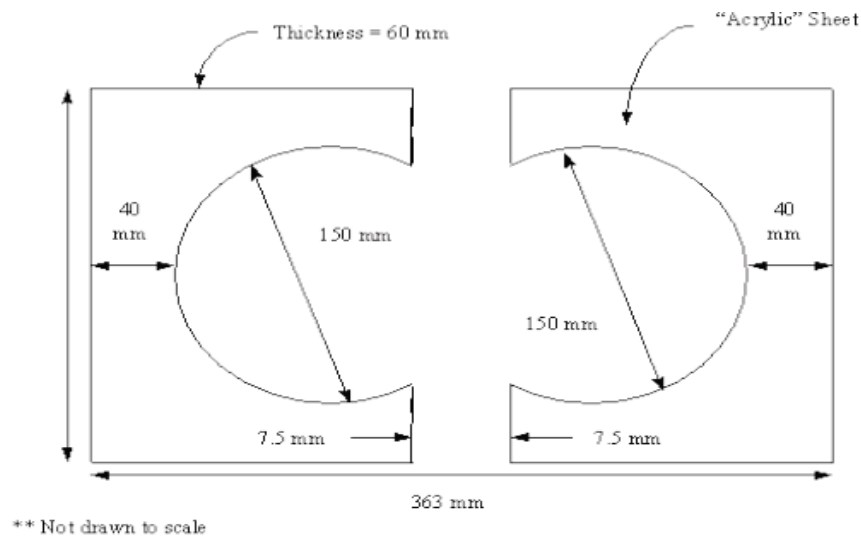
Specimen Configuration for the Hamburg Wheel Tracking Device.
